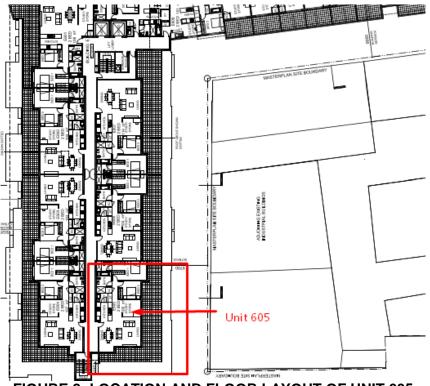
LOCATION AND FLOOR LAYOUT OF UNIT 605
